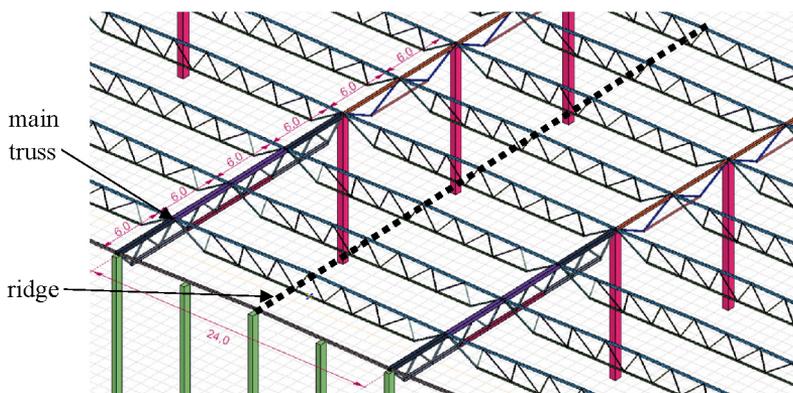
Simplified geometry of main steel structure of roof implemented in calculation model
